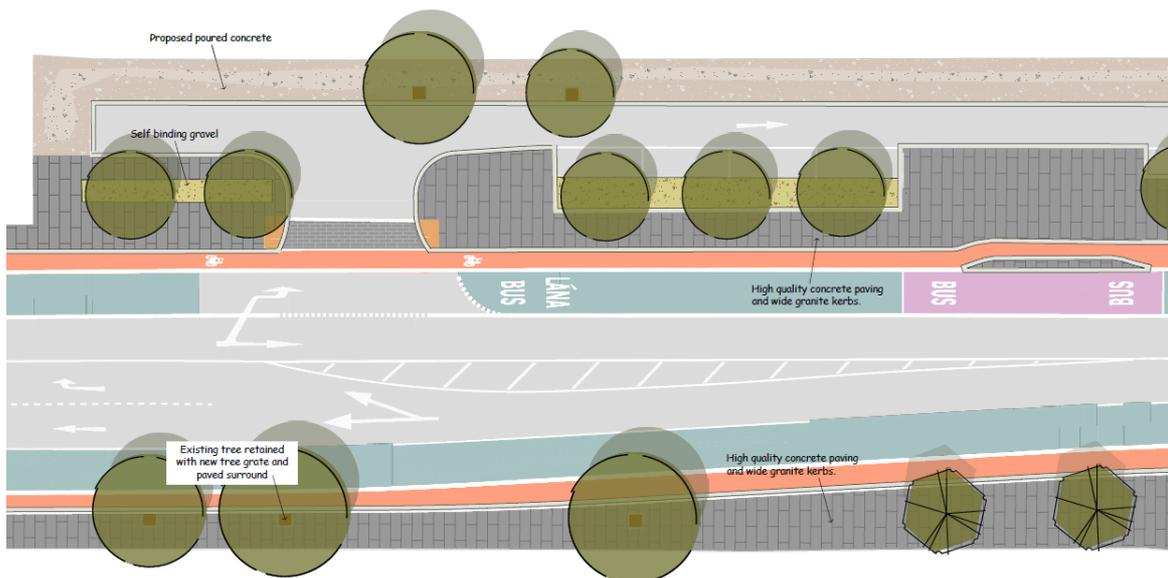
House No. 388 to No. 370 Ballyfermot Road
